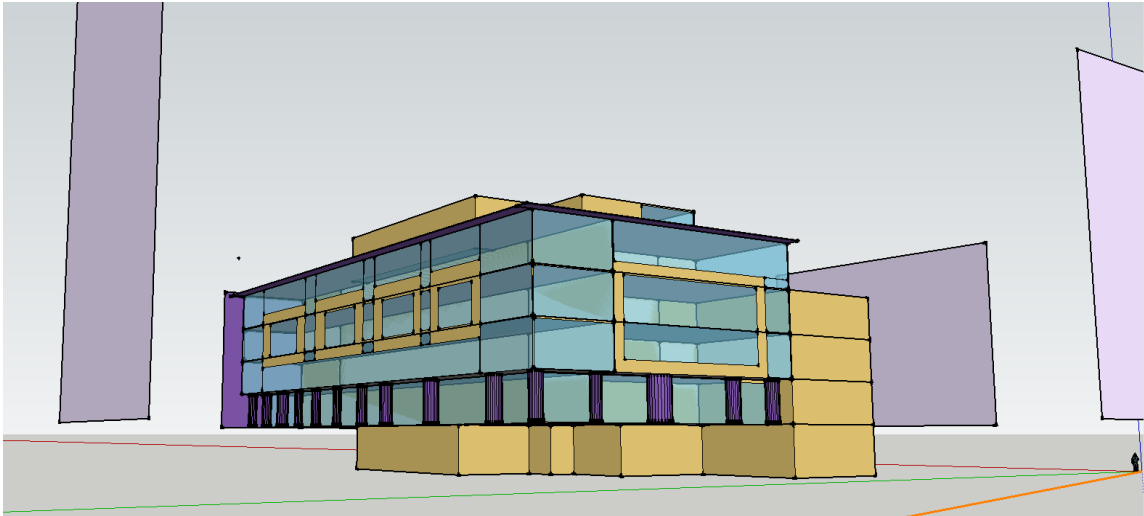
Mona Campbell Building – 3D rendering with shading surfaces
